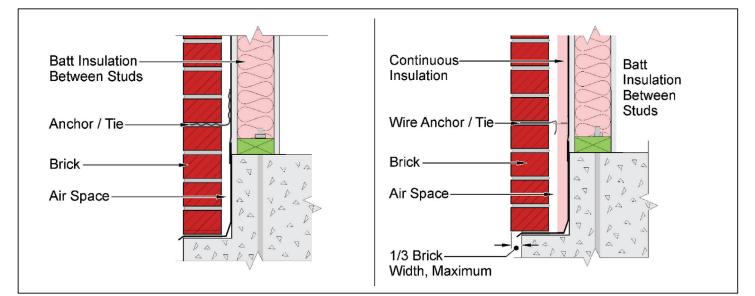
Brick Veneer Wall Assemblies. Typical (Left) and with Continuous Insulation (Right) Note that the addition of continuous insulation requires the use of wire anchors/ties.
